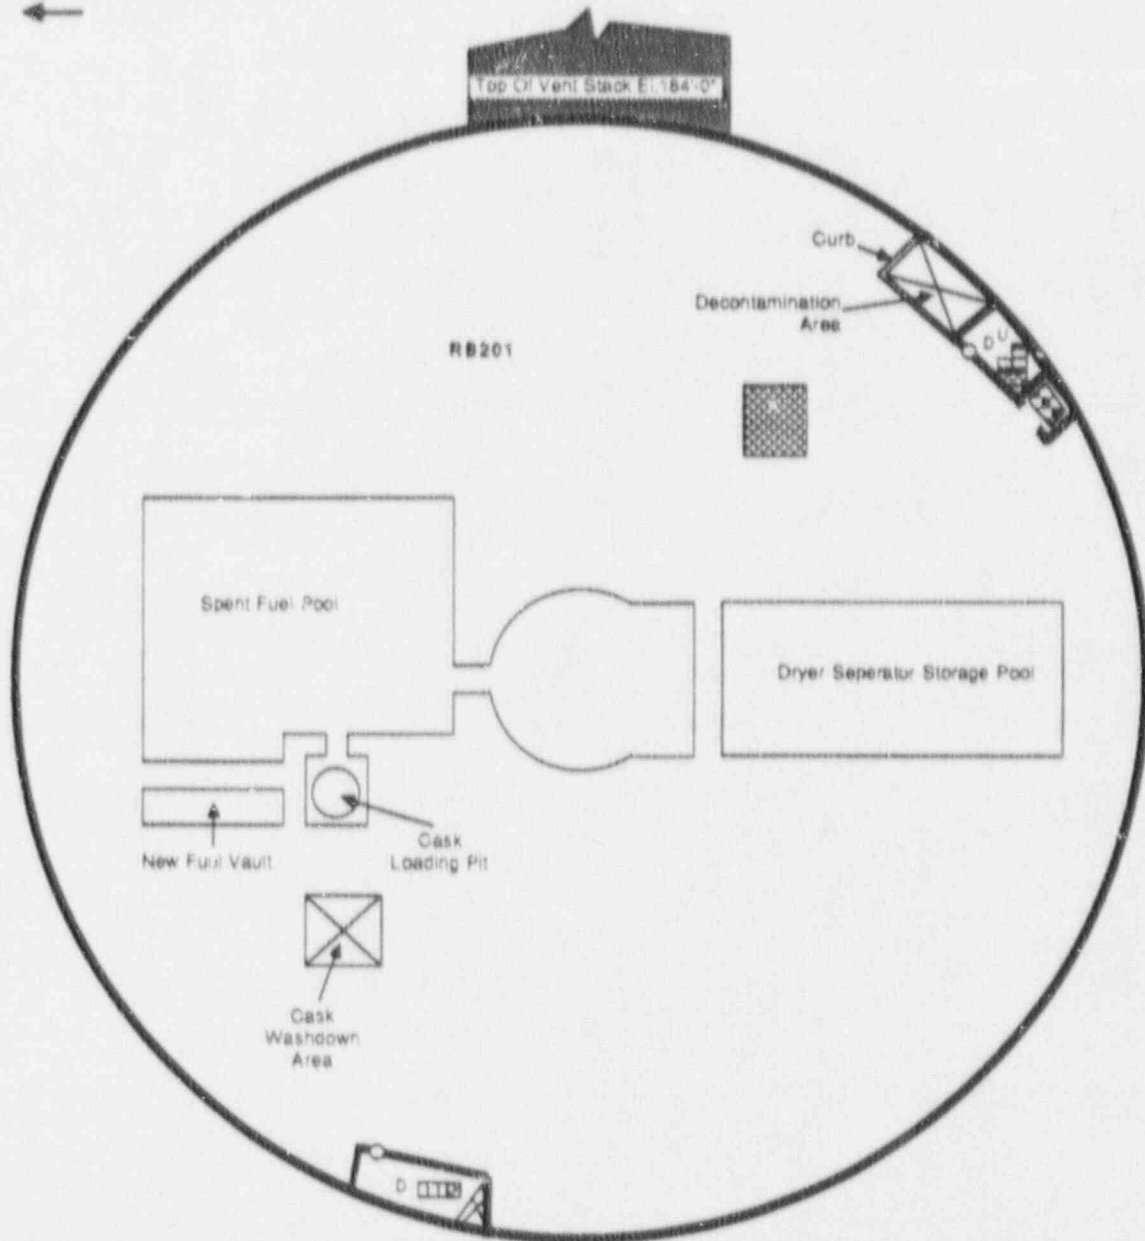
Hope Creek Reactor Building Elevation 201'-0"
